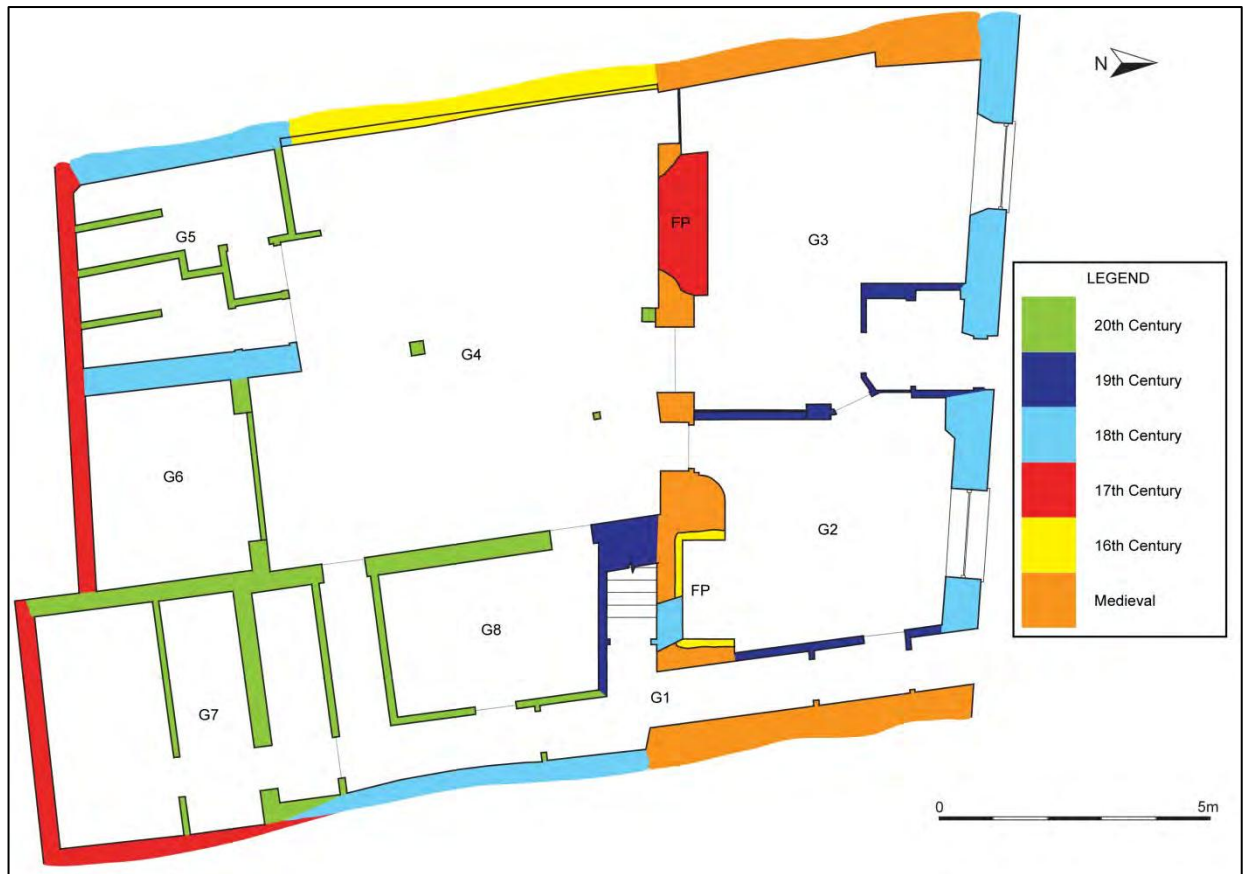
Phased ground floor plan of The Red Lion, Ashburton.
